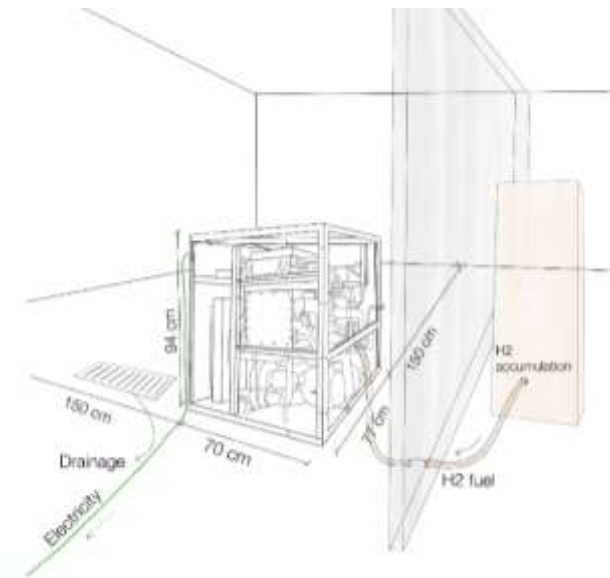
Installation requirements of product D. Plan and elevation. Author Sara Dorregaray-Oyaregui.
